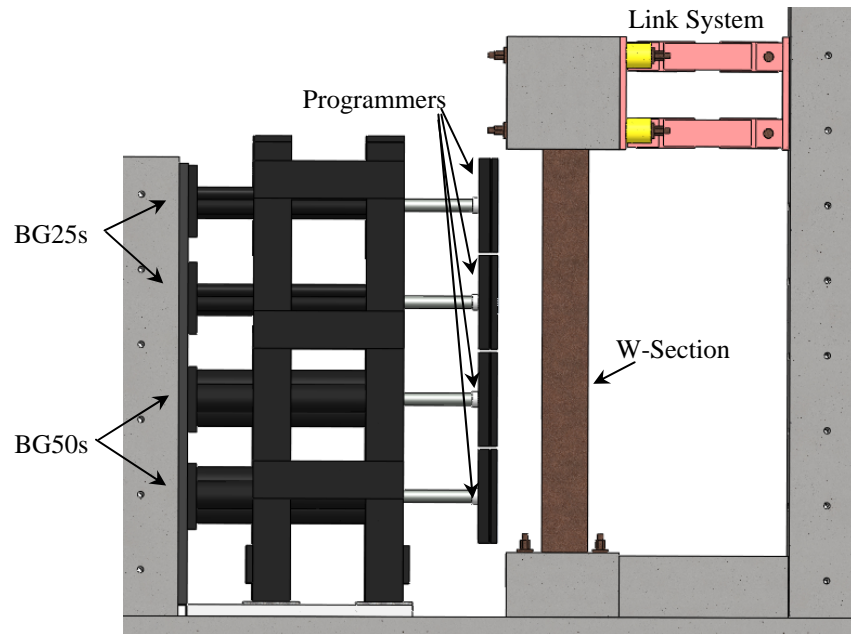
Side Elevation of Steel Column Weak Axis Test Setup
